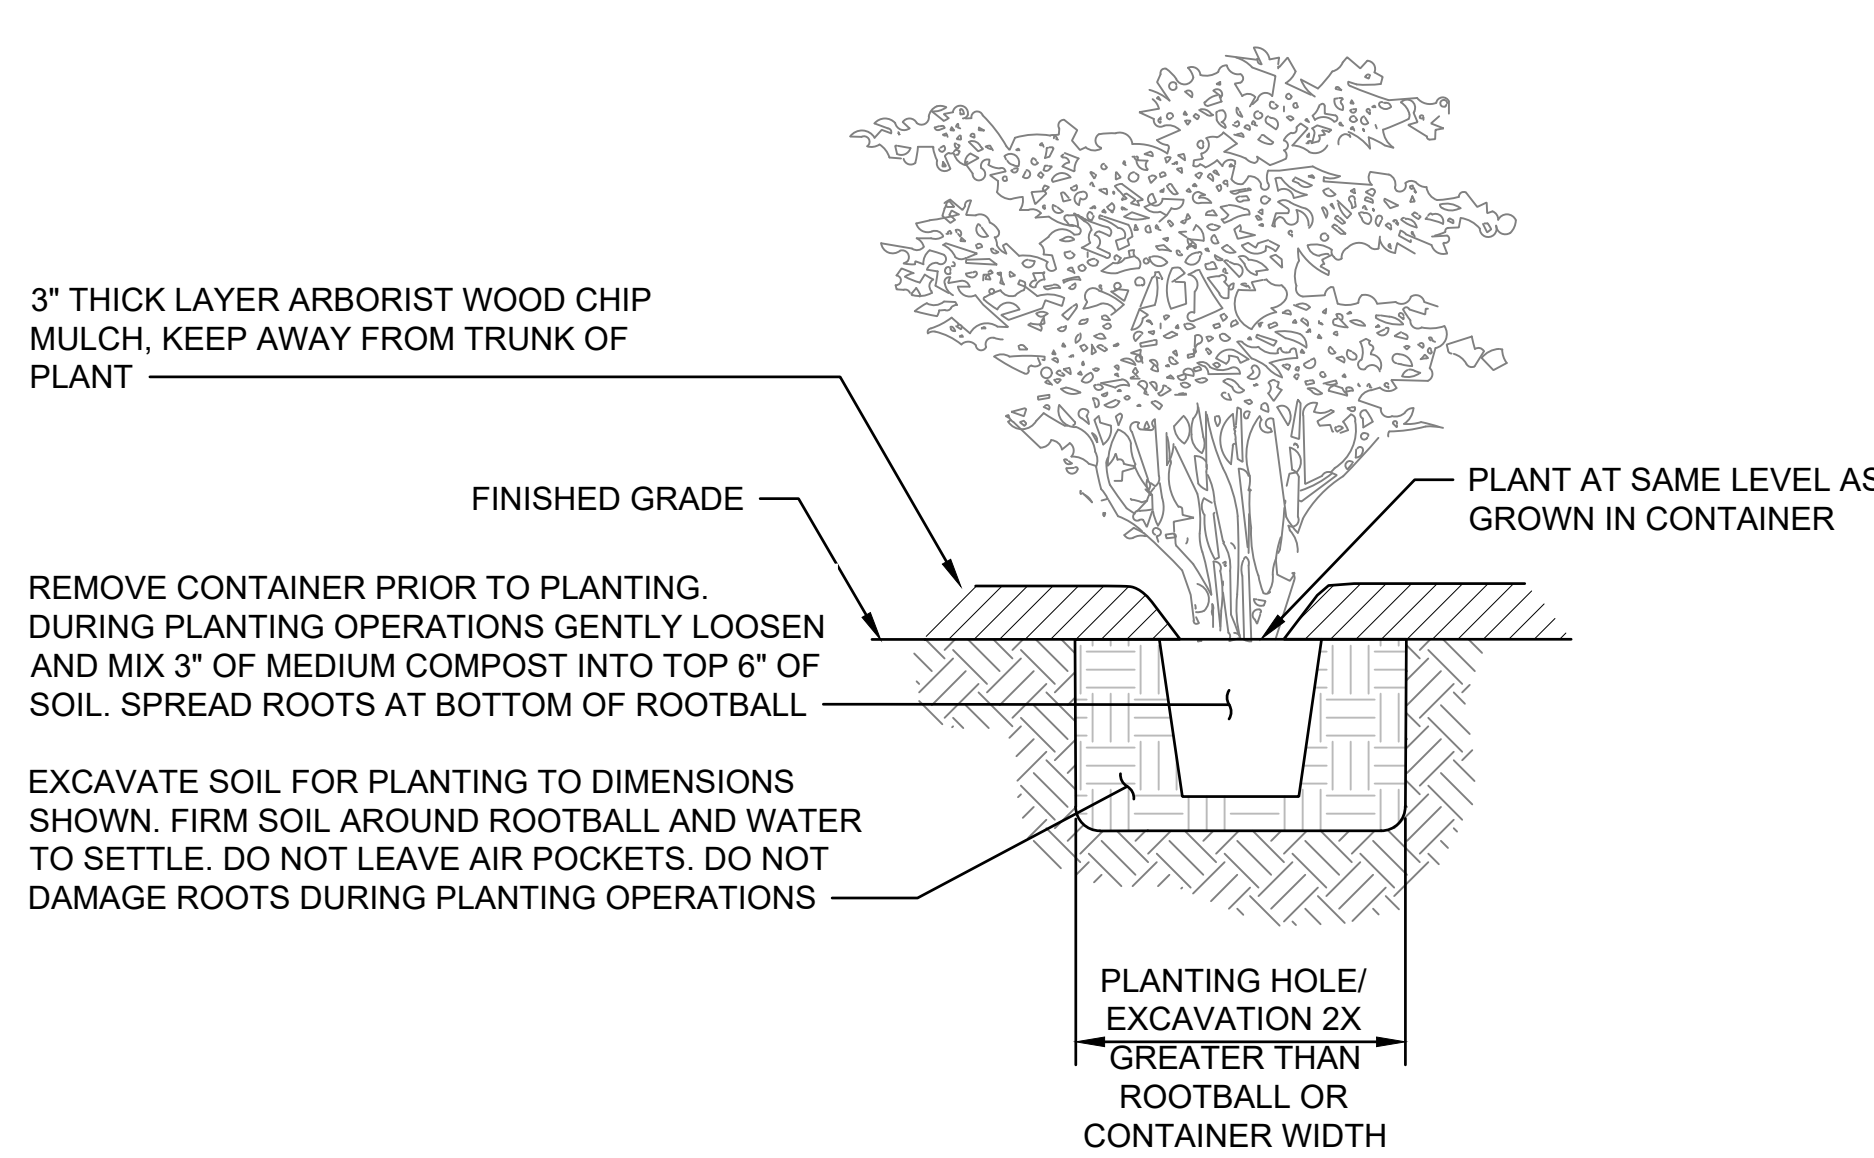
DETAIL - TREE AND SHRUB PLANTING ON SLOPES
